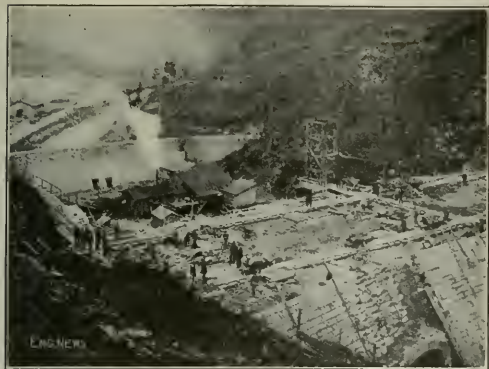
KRAUSEBAUDEN DAM IN COURSE OF CONSTRUCTION
